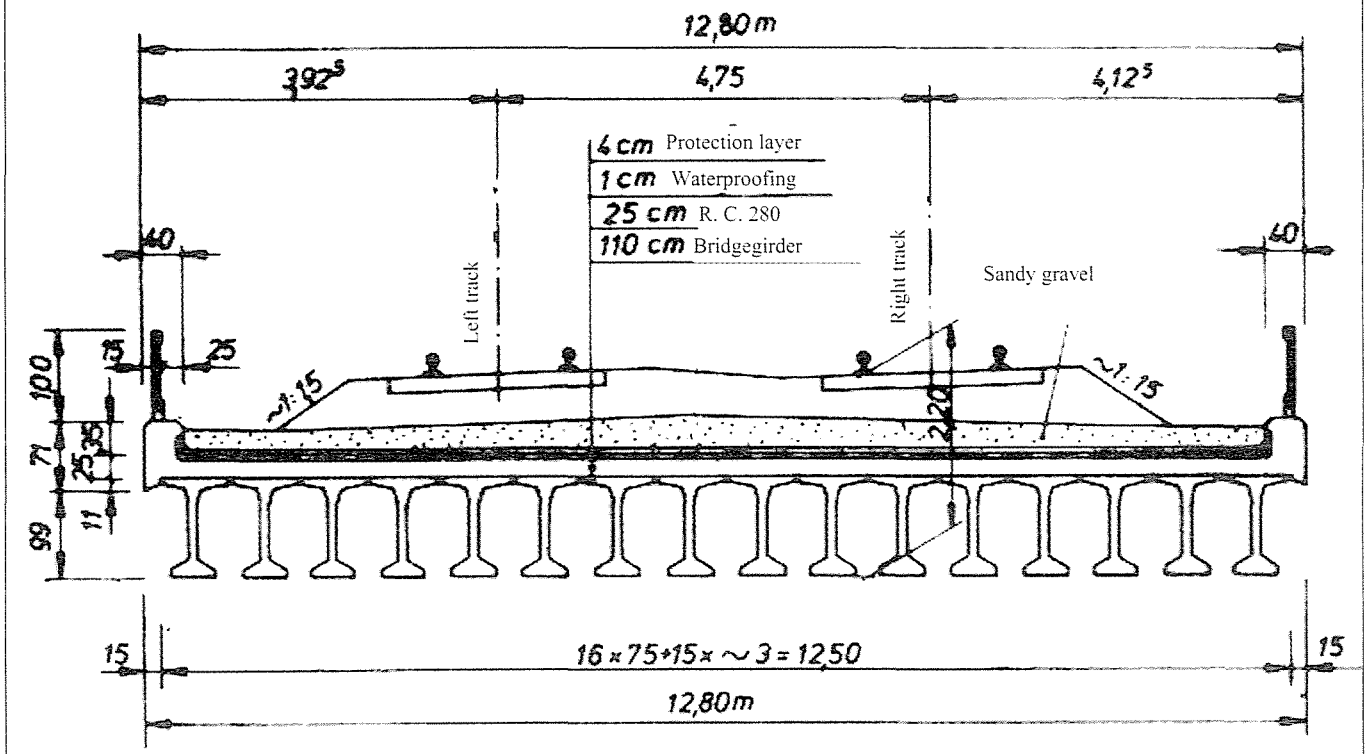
Elements of the first prestressed concrete bridge at Recsk
